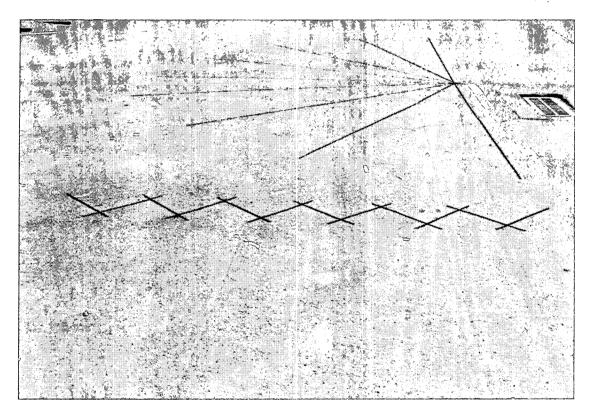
Test (Sawcuts) Cracks at the Caltrans Transportation Laboratory
